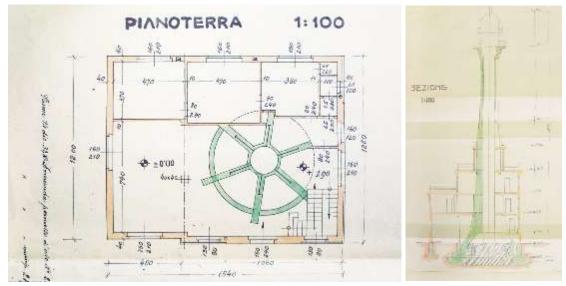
Lighthouse Mlaka: Ground floor and Section.
